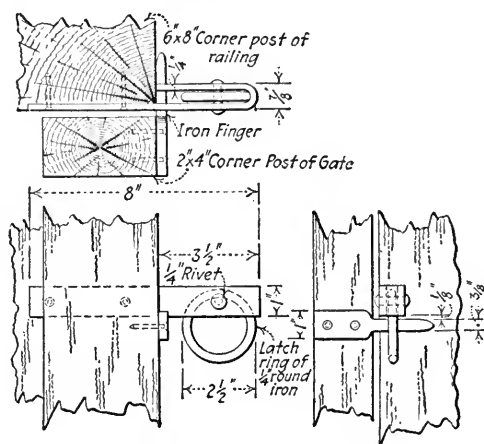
RING AND FINGER LATCH ON SHAFT GATE.
